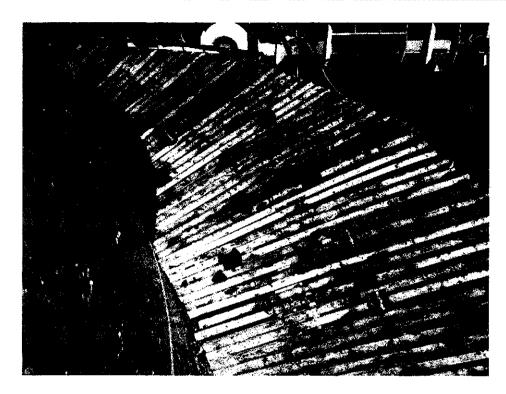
, Numerous nuts, washer, bearing and spacers on the crane platform
